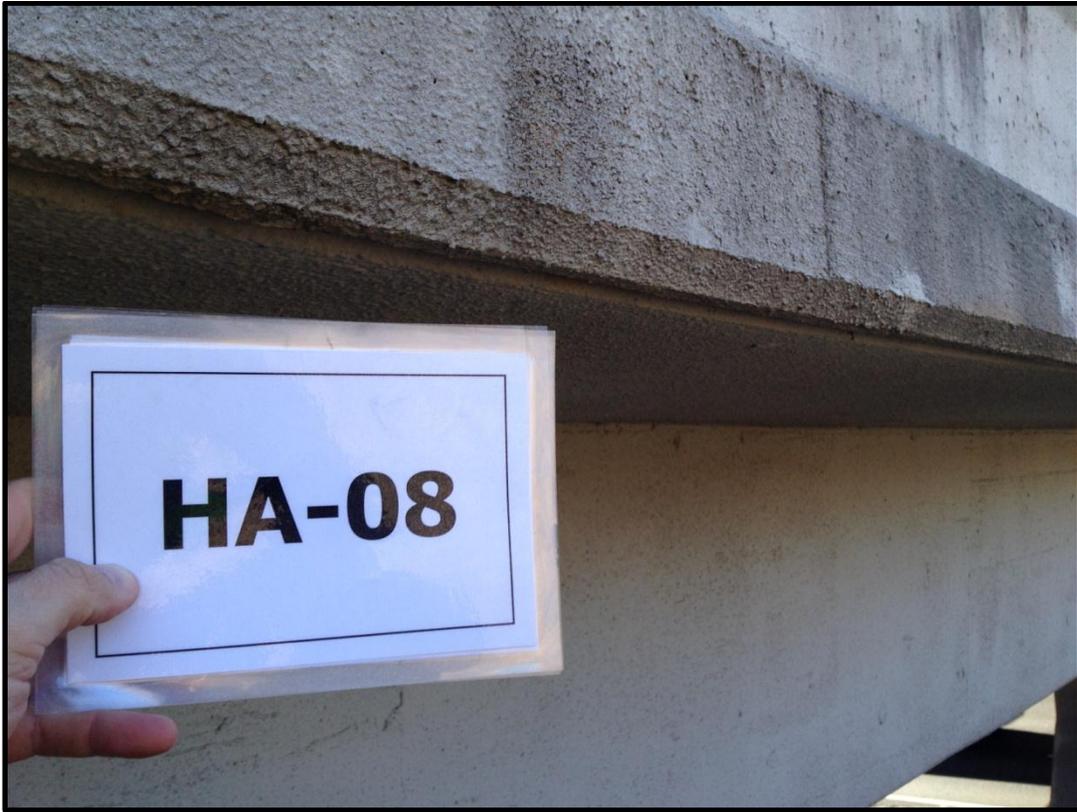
HA-8 – Asbestos skim coat on bridge overhang.
